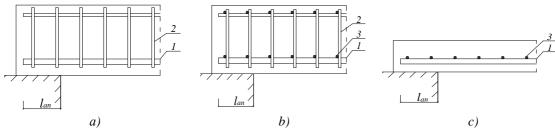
The anchorage of welded longitudinal reinforcement bars on free end supports of flexural members: a) – in beams with welded reinforcement, b) – in beams with space welded frame, c) – in fabric-reinforced slabs (1 - longitudinal reinforcement, 2 - cross reinforcement, 3 - distribution reinforcement)
